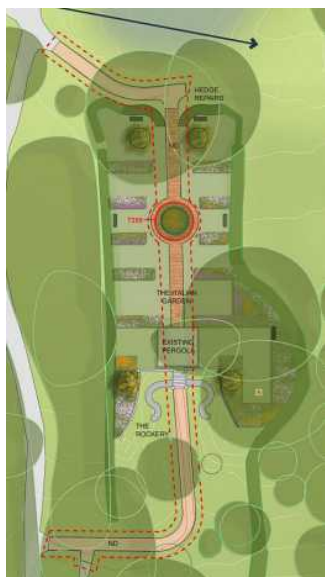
Proposed layout of works to the house and immediate area (area 1).
